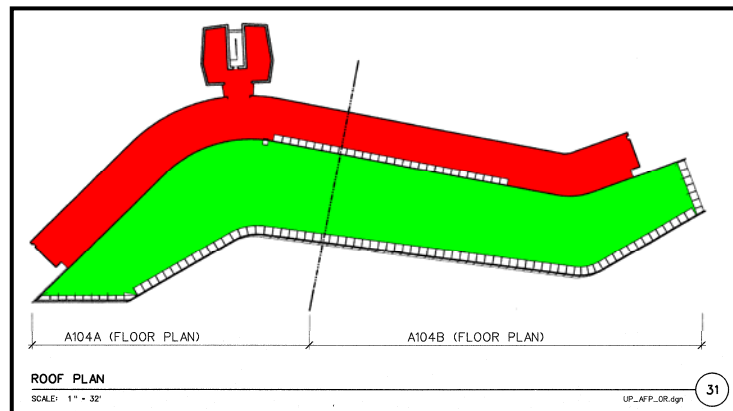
Green roof (Green) and TPO (Red) roofing systems
